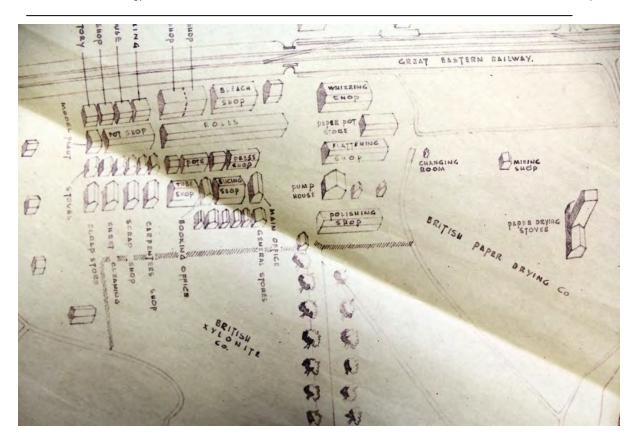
Plan of Brantham Works, north of railway line, 1905 (SRO Ref. HC 410/A7/8)
